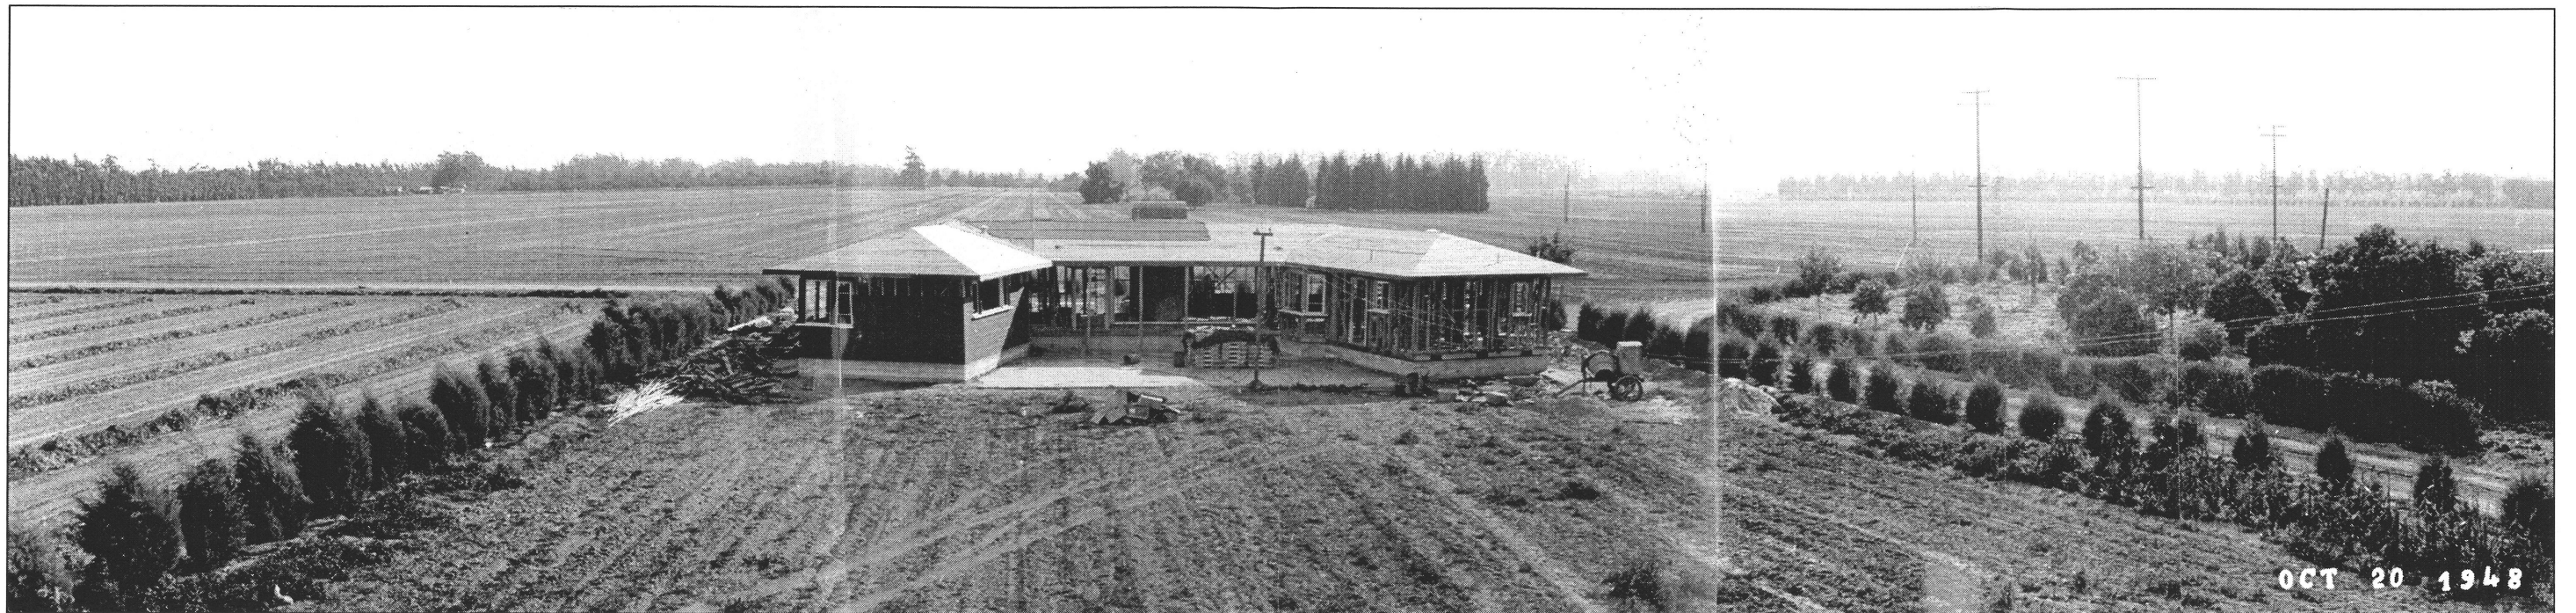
North elevation, looking south, dated October 20, 1948. Insulation has been installed on the east wing of the house.
